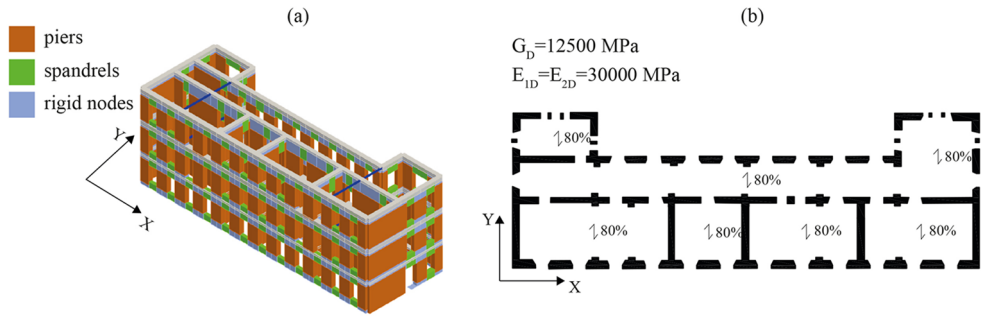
(a) 3D view of the geometrical model of BLDG2 and (b) floor plan of the building.
